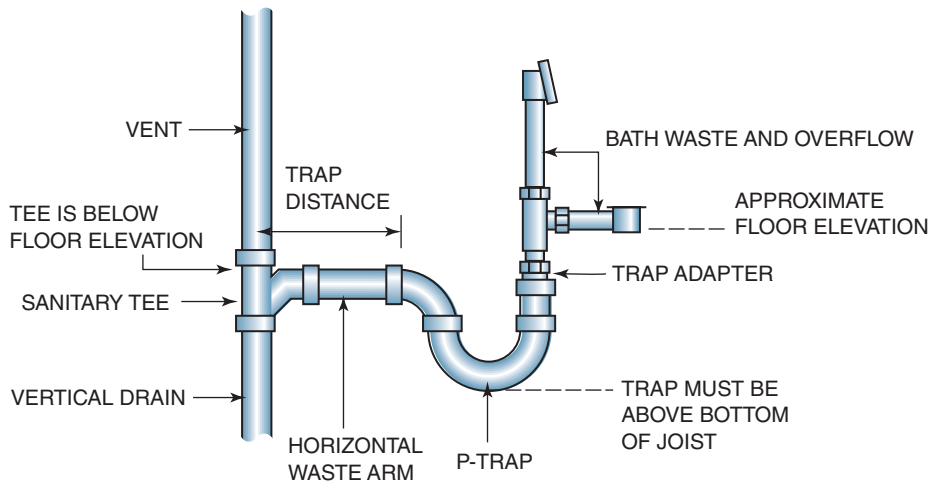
A bathtub is typically installed during the rough-in phase of construction. A plumber connects a bath waste and overflow to the drainage piping.
